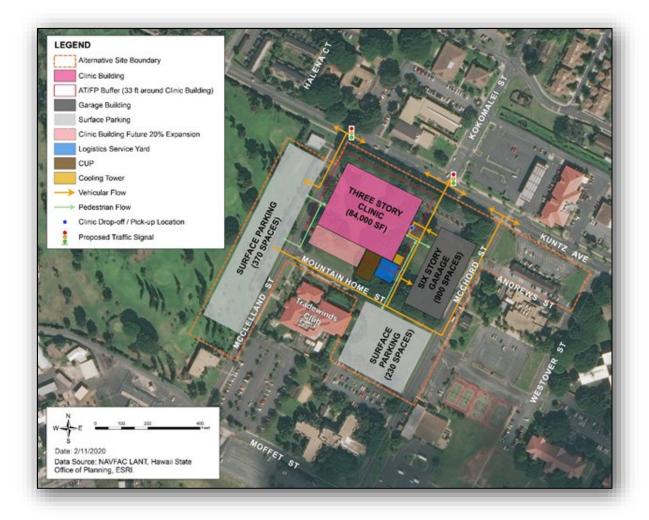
Proposed Conceptual Site Plan of Alternative 1: Tradewinds-Par 3 Site
